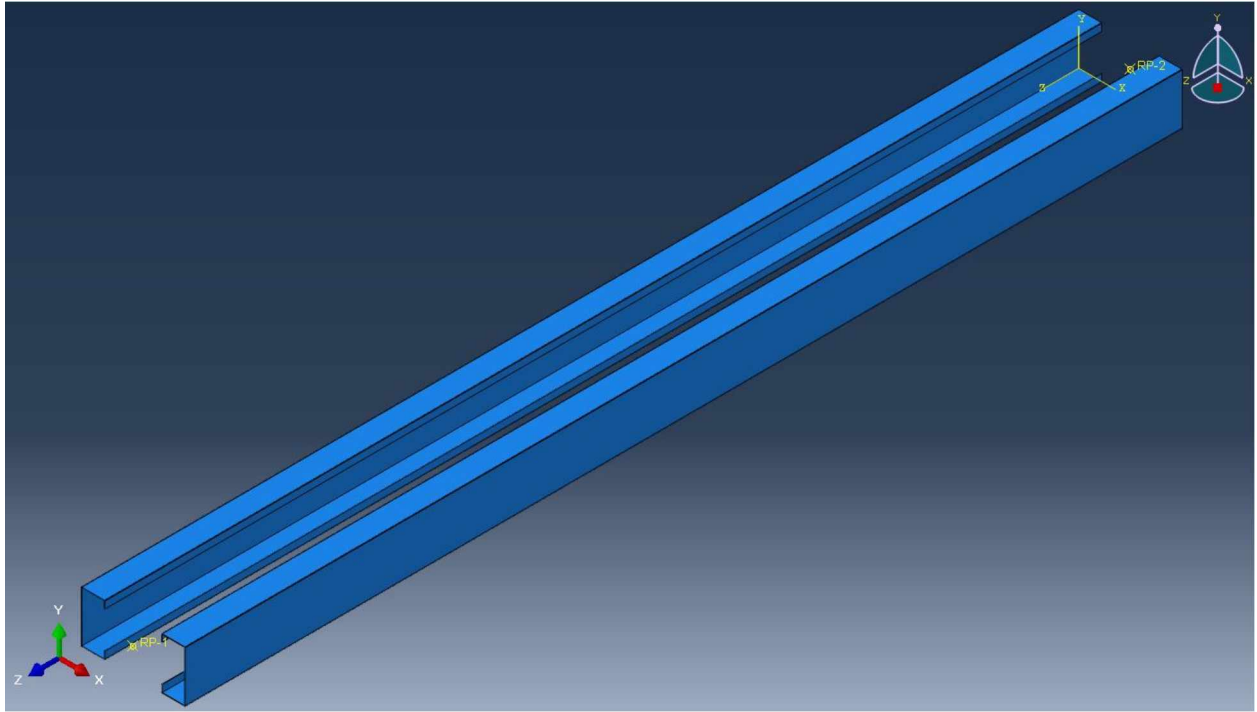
Two 72 in long 362S162-33 cold-formed steel studs connected together without lateral bracing
